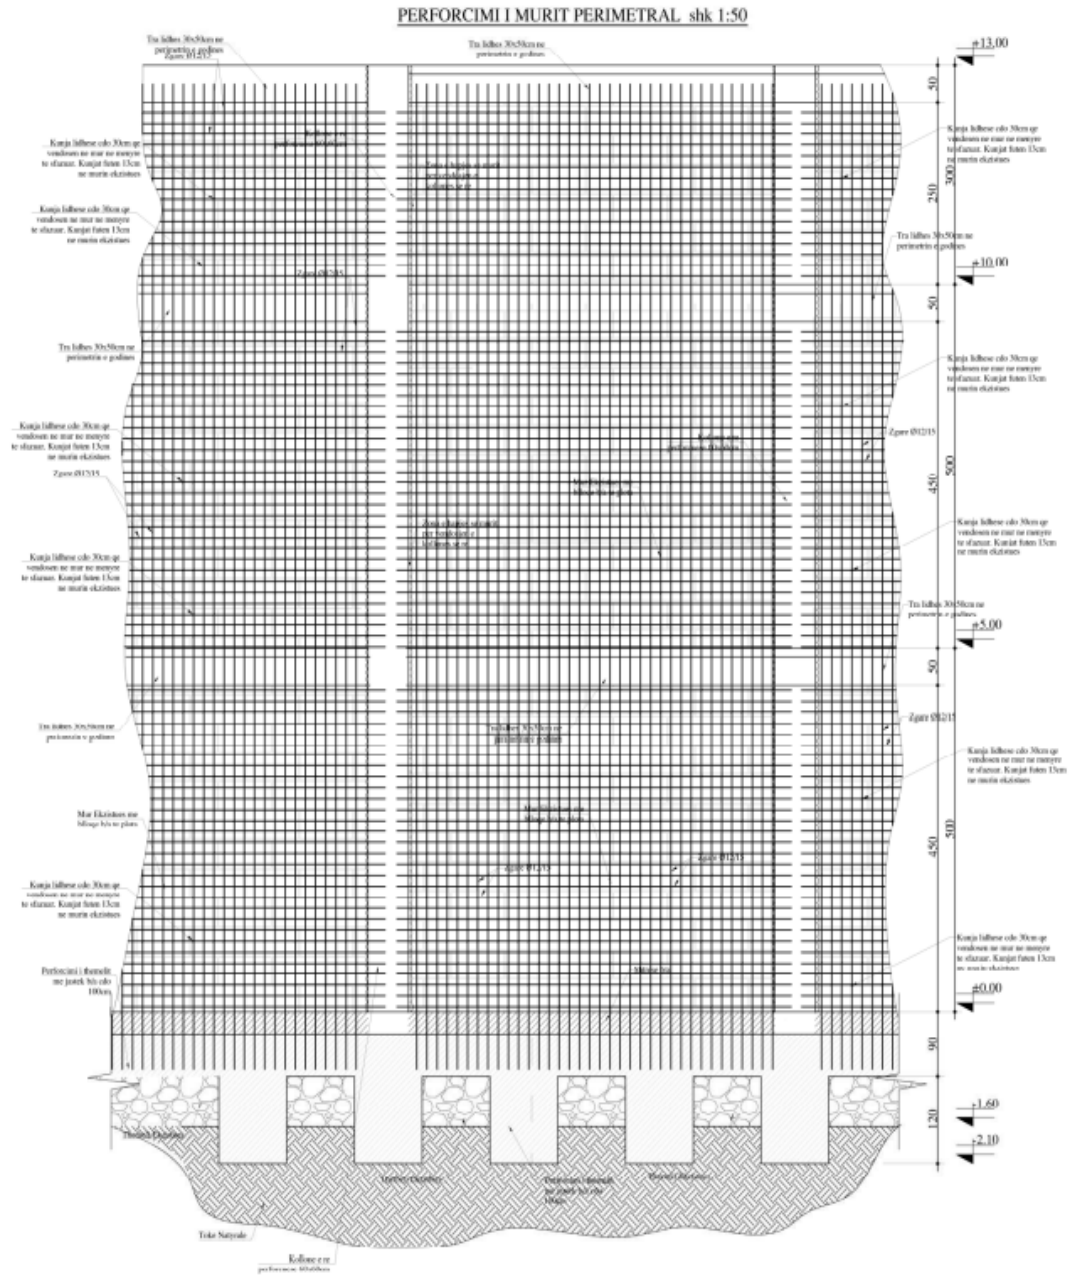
Reinforcement of the perimeter wall with steel mesh.
